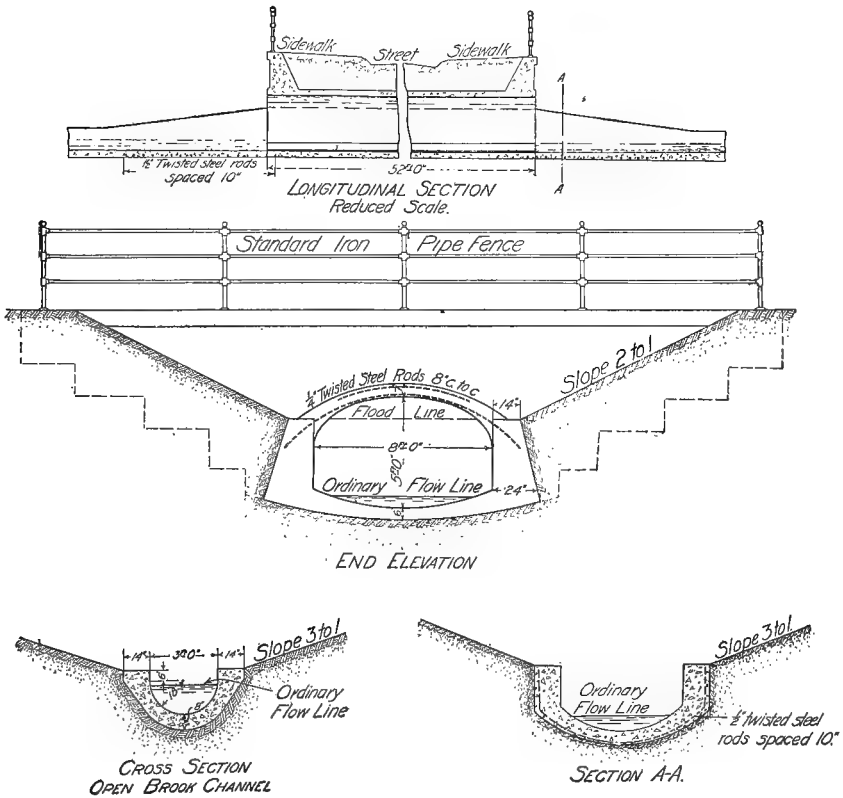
CONCRETE BROOK LINING IN NEWTON, MASS.
